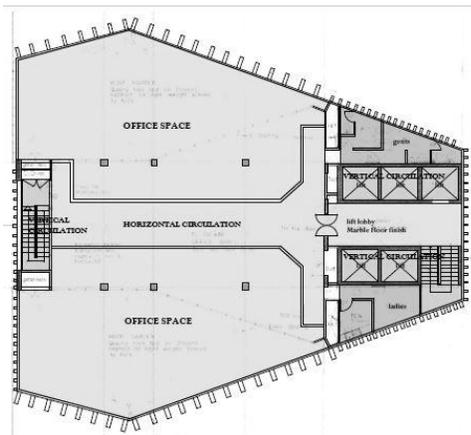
Lonrho house typical floor plan Source: Architect (author modified)
